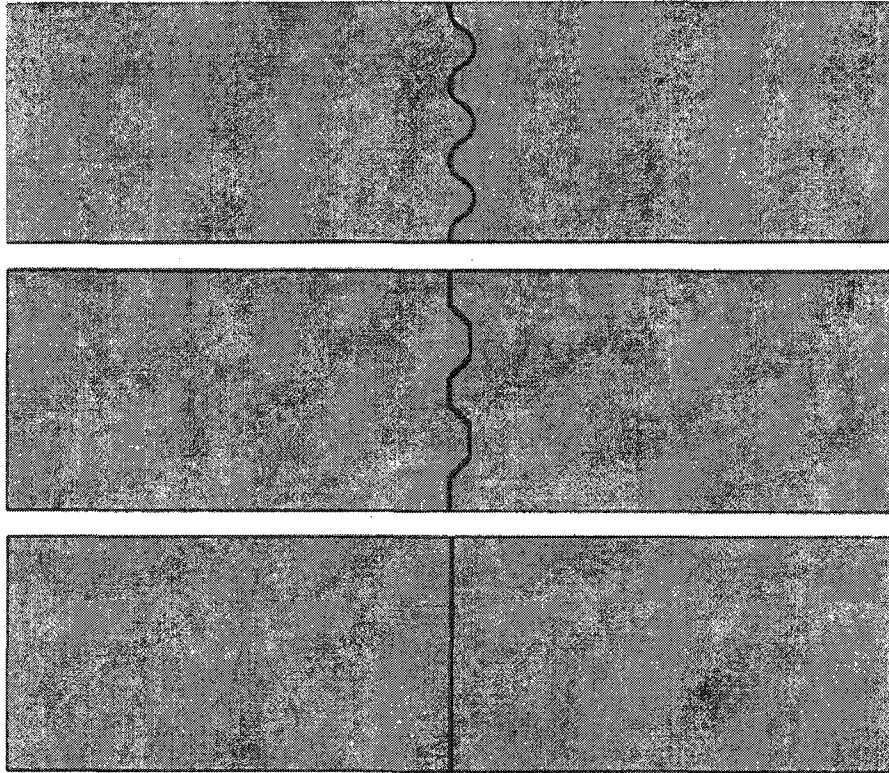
Examples of precast bridge deck panel connections (Robert, 2009)
